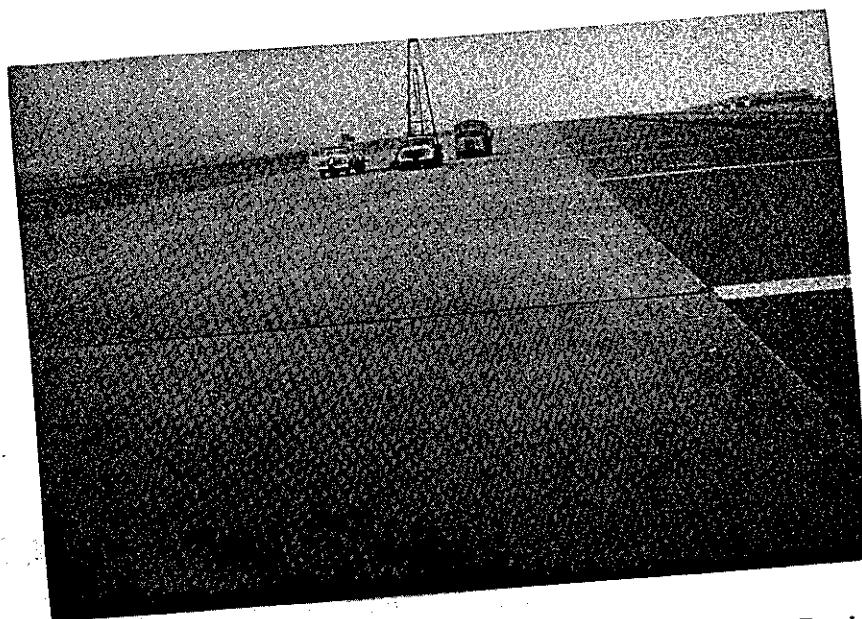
Drill rig at Well 6; low swale in East Taxiway; water stays in structural section a long time after it stops raining.
